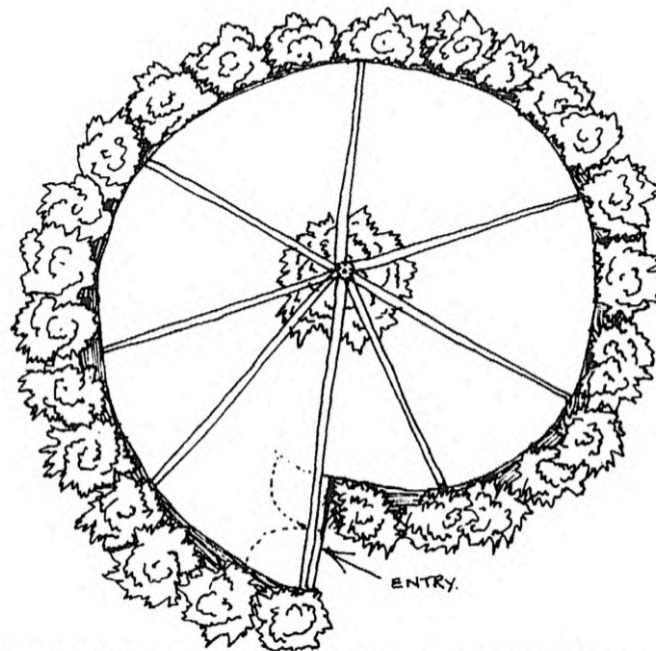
PLANT HOUSE 1 (PLAN). SLAB ON GROUND, SPIRAL OF BAMBOO, POPLAR, CENTRED ON EXISTING TREE, POLE, OR LARGE POPLAR STAKE. WALLS WOVEN AND IVY-COVERED TO ROOF. CHEAP LIVESTOCK SHELTER.
